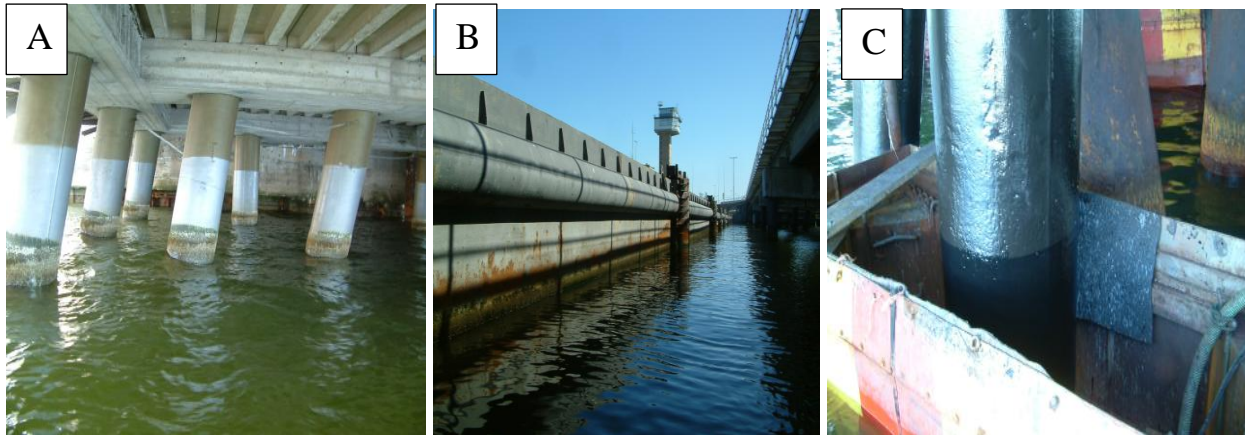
(A) View of corrosion damage to piles at the waterline, (B) View of corrosion damage to the pier structure, (C). Caisson structure for anticorrosion work
